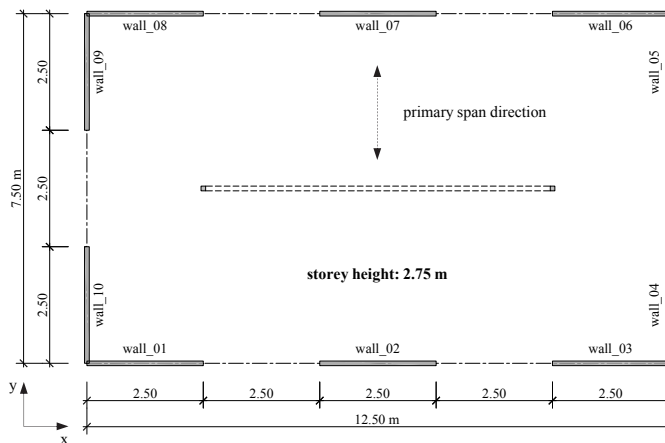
floor plan of two-storey structure, Hummel (2016) – revised
